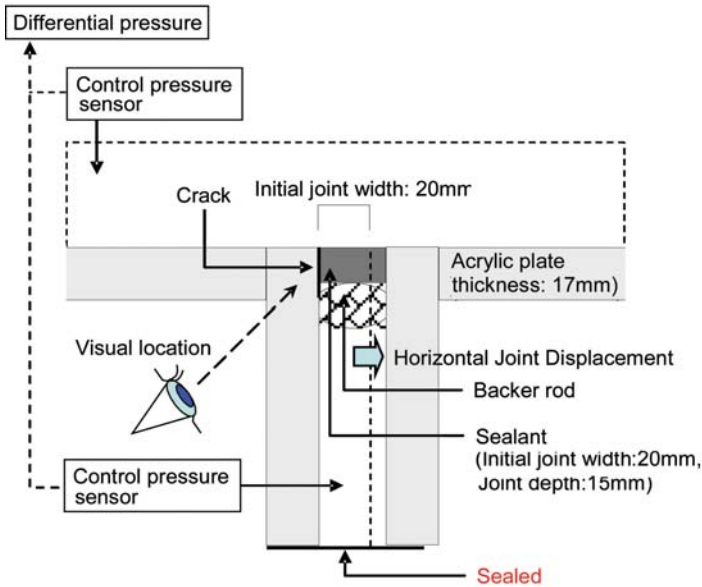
Horizontal sectional view of the vertical joint test specimen at crack location; the eye icon indicates the position of the observer in relation to that of the crack location.
